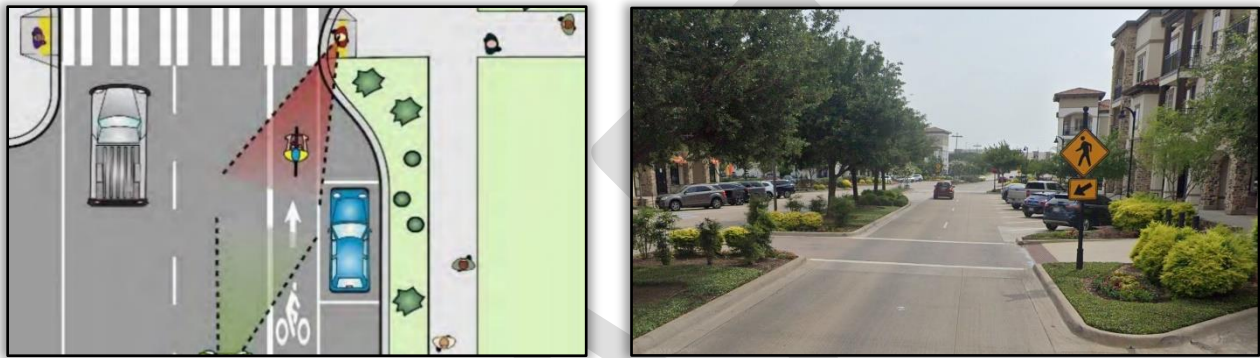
Examples of Curb Extensions at an Intersection and Mid-block Crosswalk
